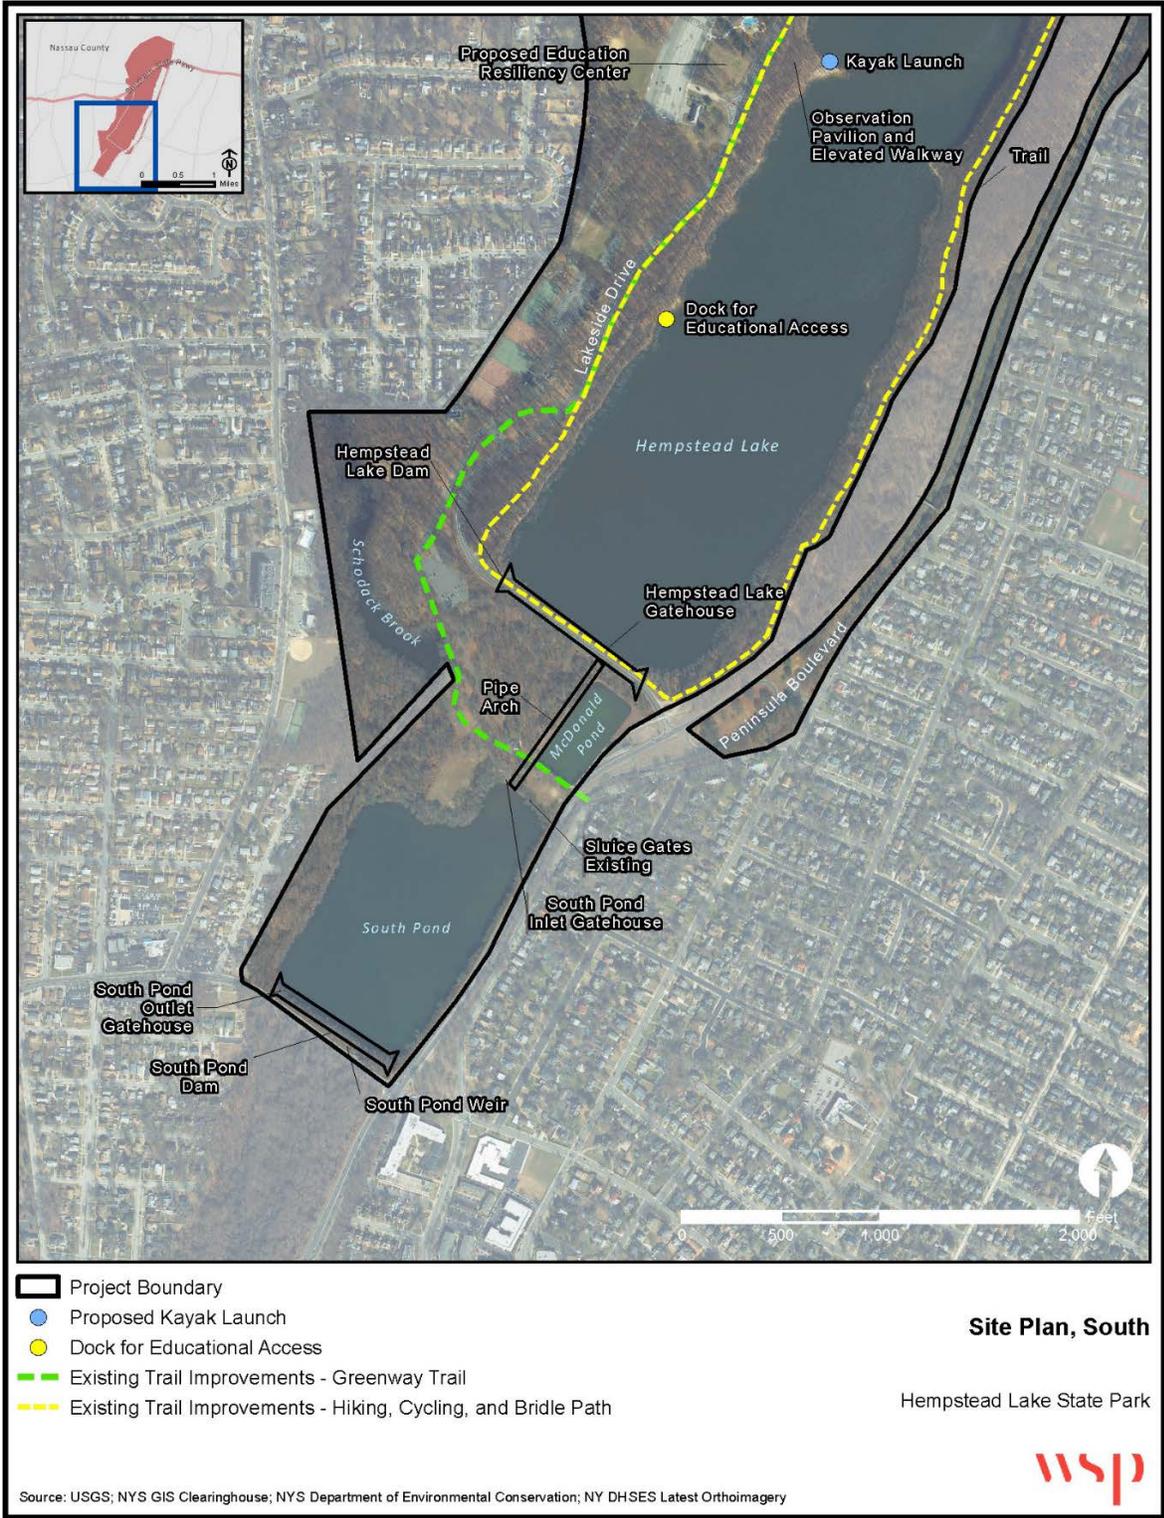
Hempstead Lake State Park Project - Site Plan, South
